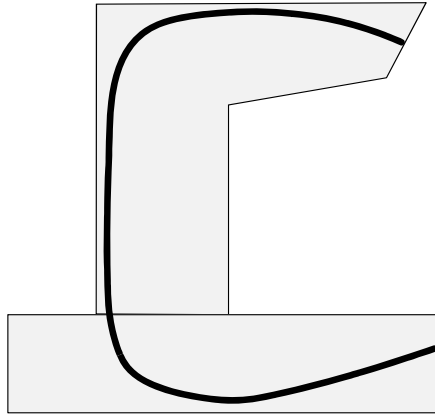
Example of Fully Prestressed Cantilever Bent
